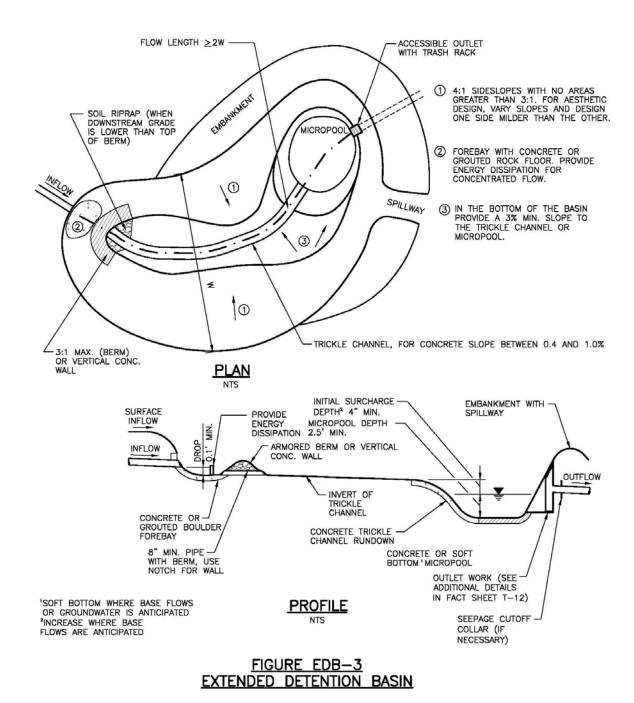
Extended Detention Basin (EDB) Plan and Profile
